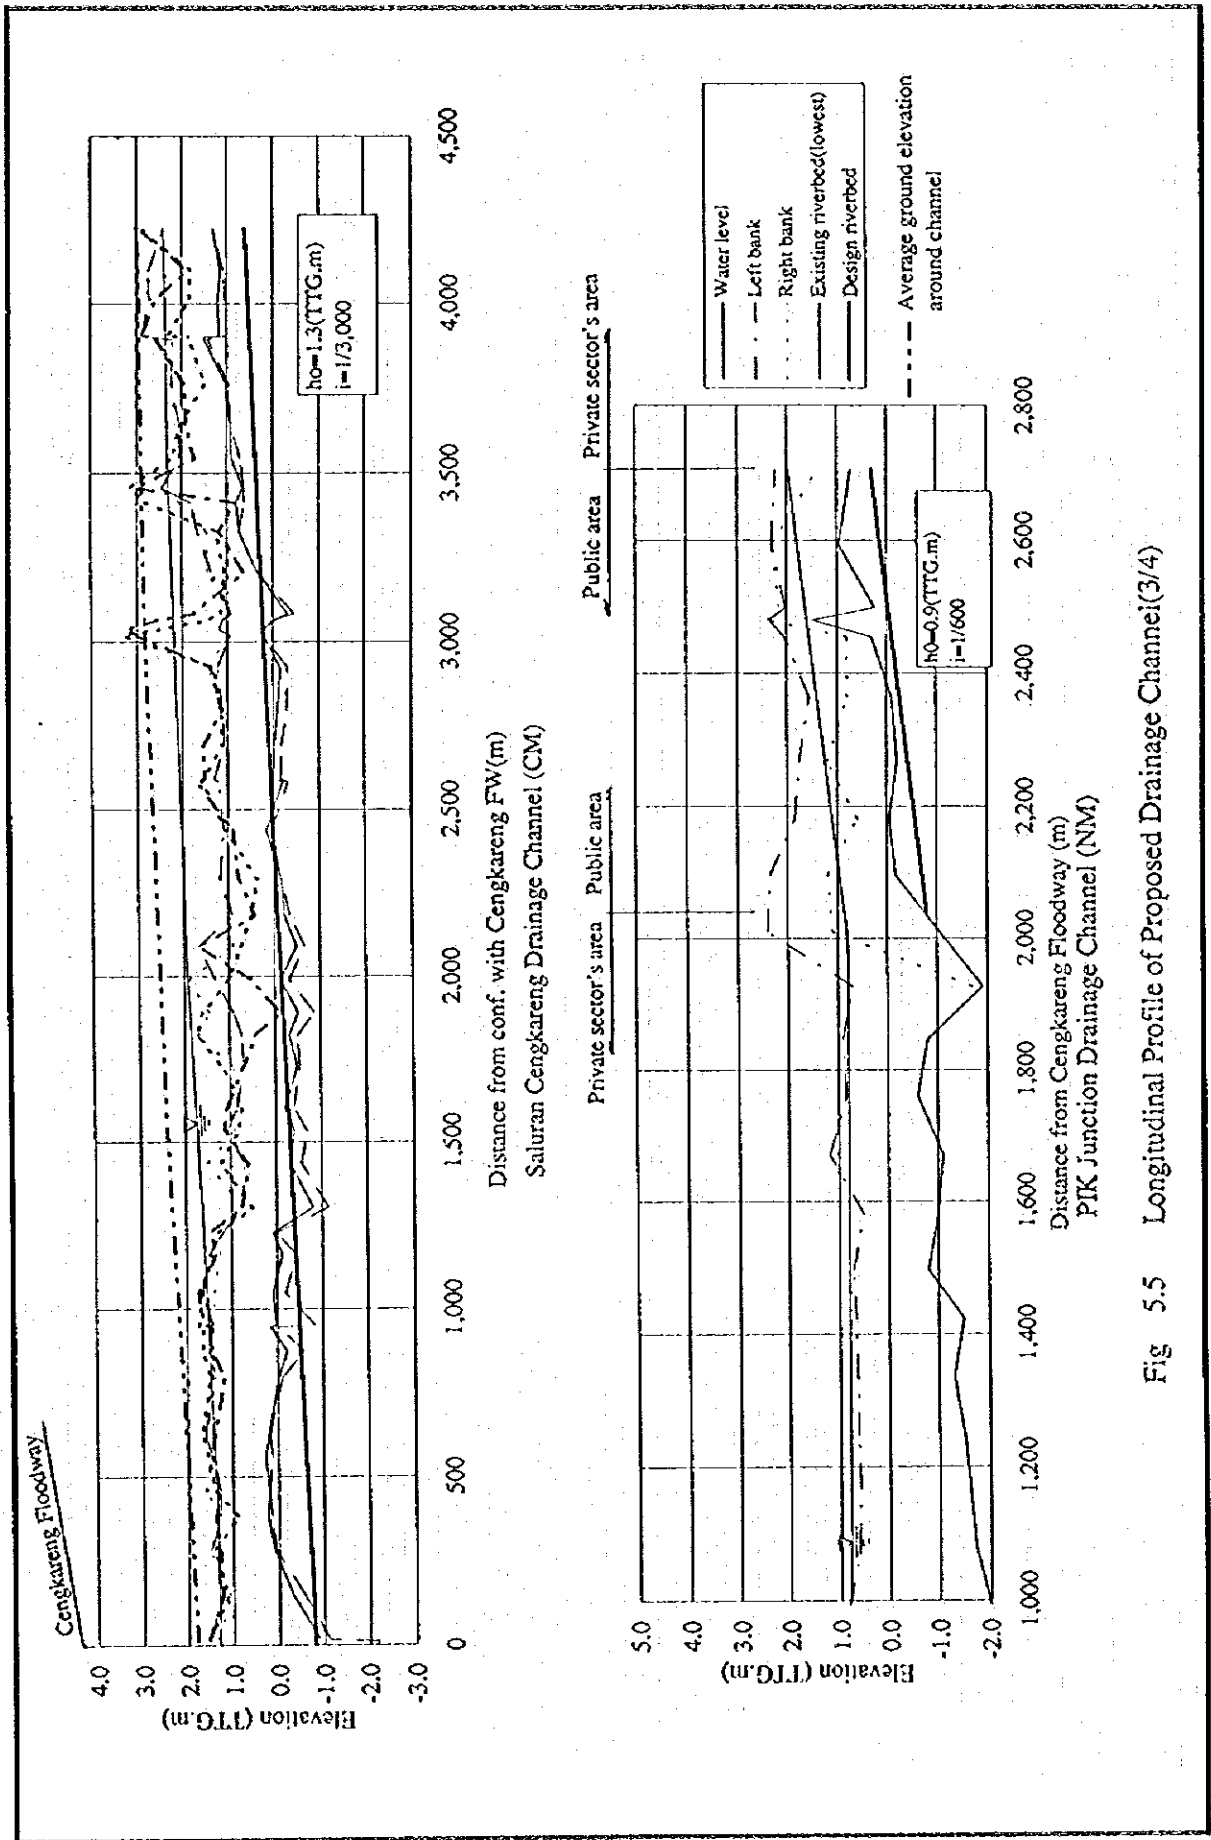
Longitudinal Profile of Proposed Drainage Channel(3/4)
